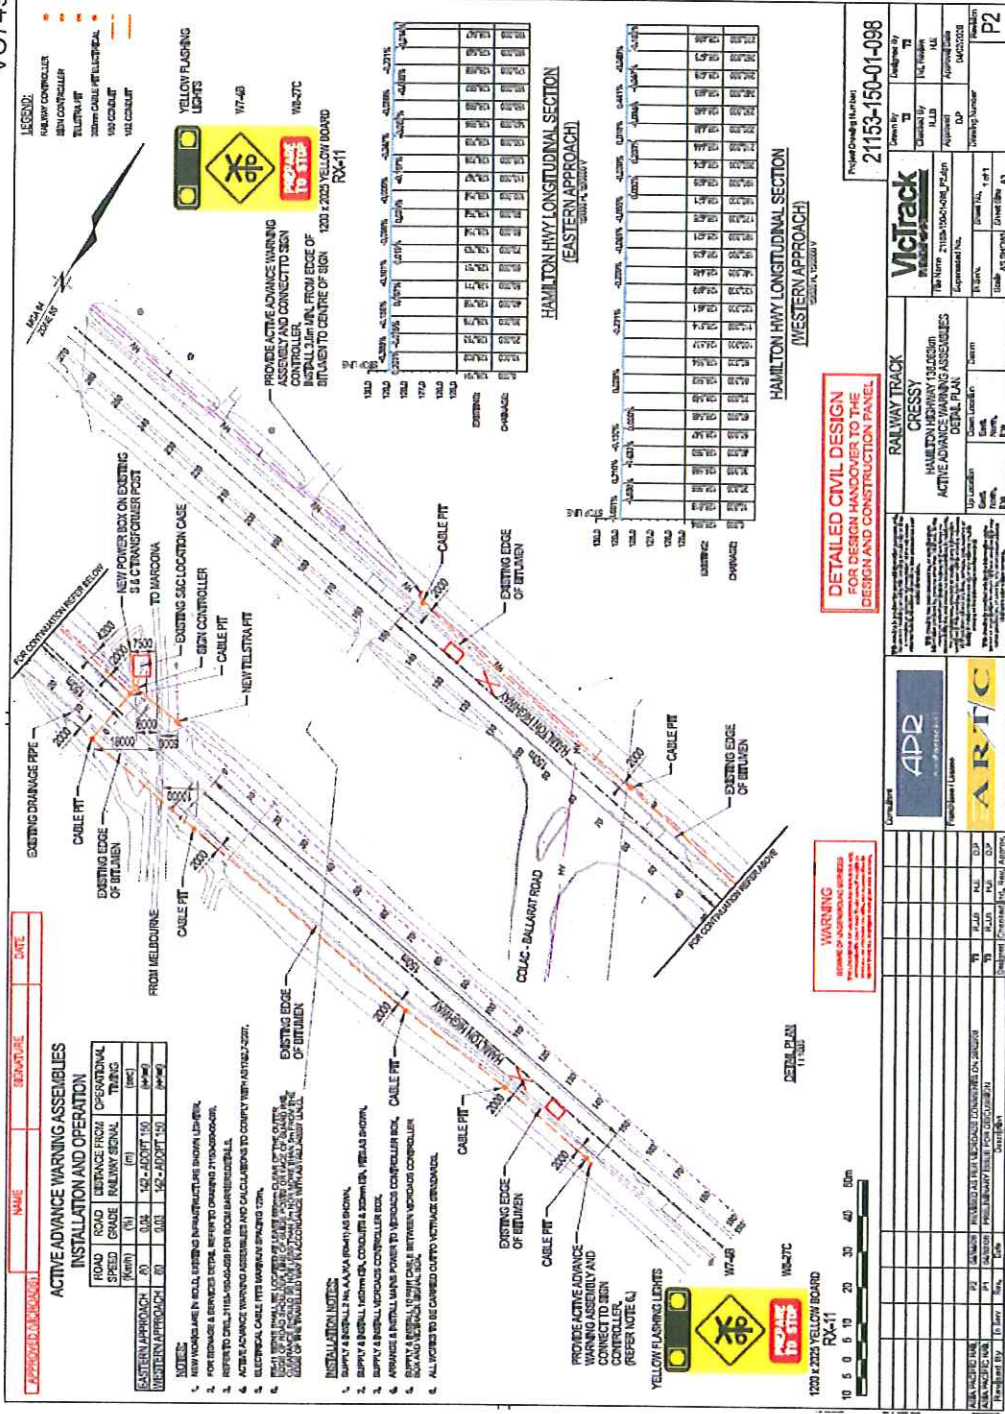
To be constructed drawings for the AAWS installation at the Cressy level crossing – plan 1
